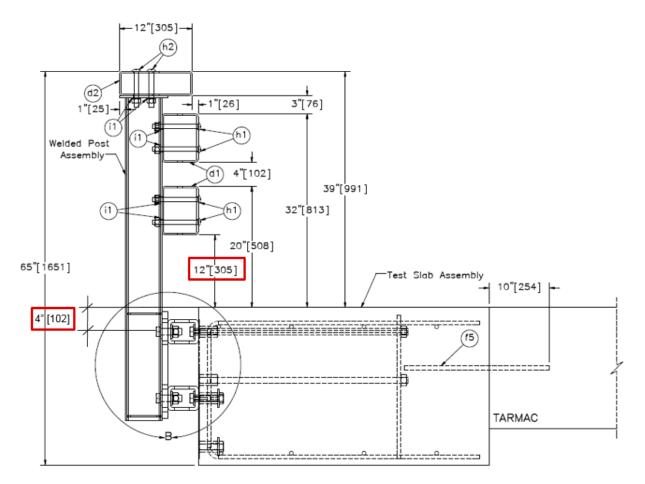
Surrogate Bridge Deck Profile View for MASH 2016 Test Designation No. 4-10
